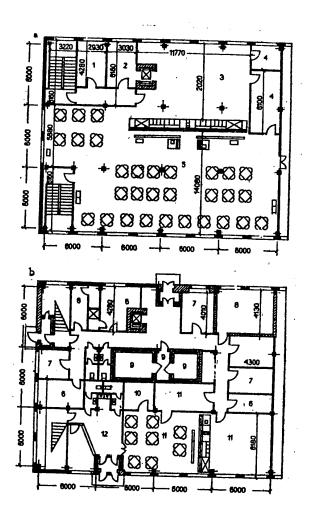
Example layout of a 250-person dining room a -- plan of the second story; b -- first story plan; 1 -- chef's room; 2 -- prepreparation; 3 -- kitchen; 4 -- washing; 5 -- dining hall; 6 -- offices and personnel rooms; 7 -- storage room; 8 -- ventilation chamber; 9 -- cooling chamber; 10 -- doctor's office; 11 -- diet room; 12 -- entrance hall
